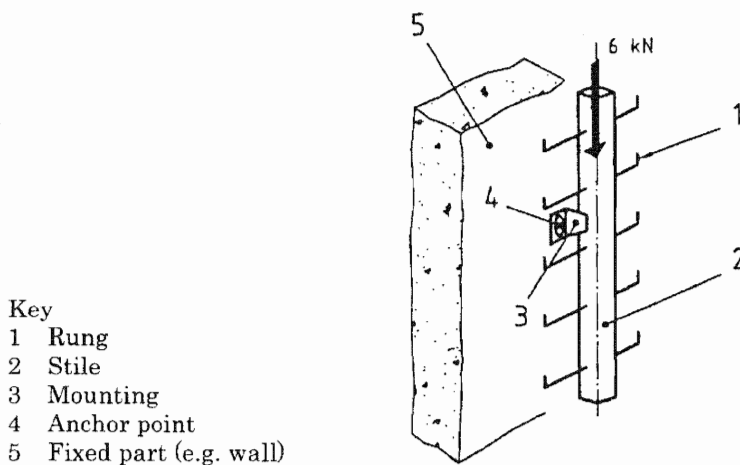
Arrangement for assessment of anchor points and connections of fixed ladders with one stile
